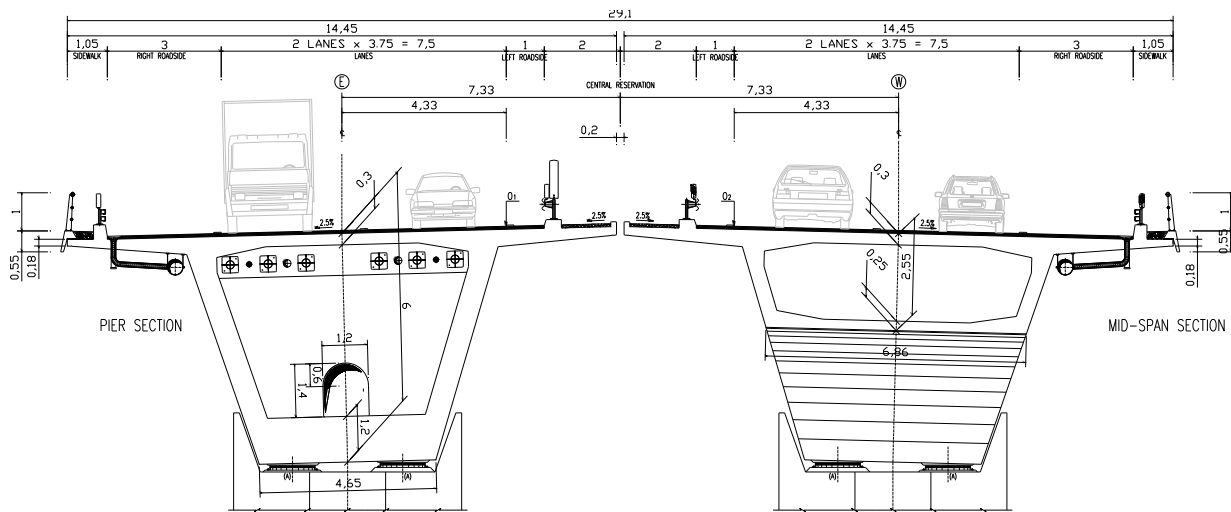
Deck cross-section of the cantilever constructed box-girder bridge over the Sorraia River [3].
